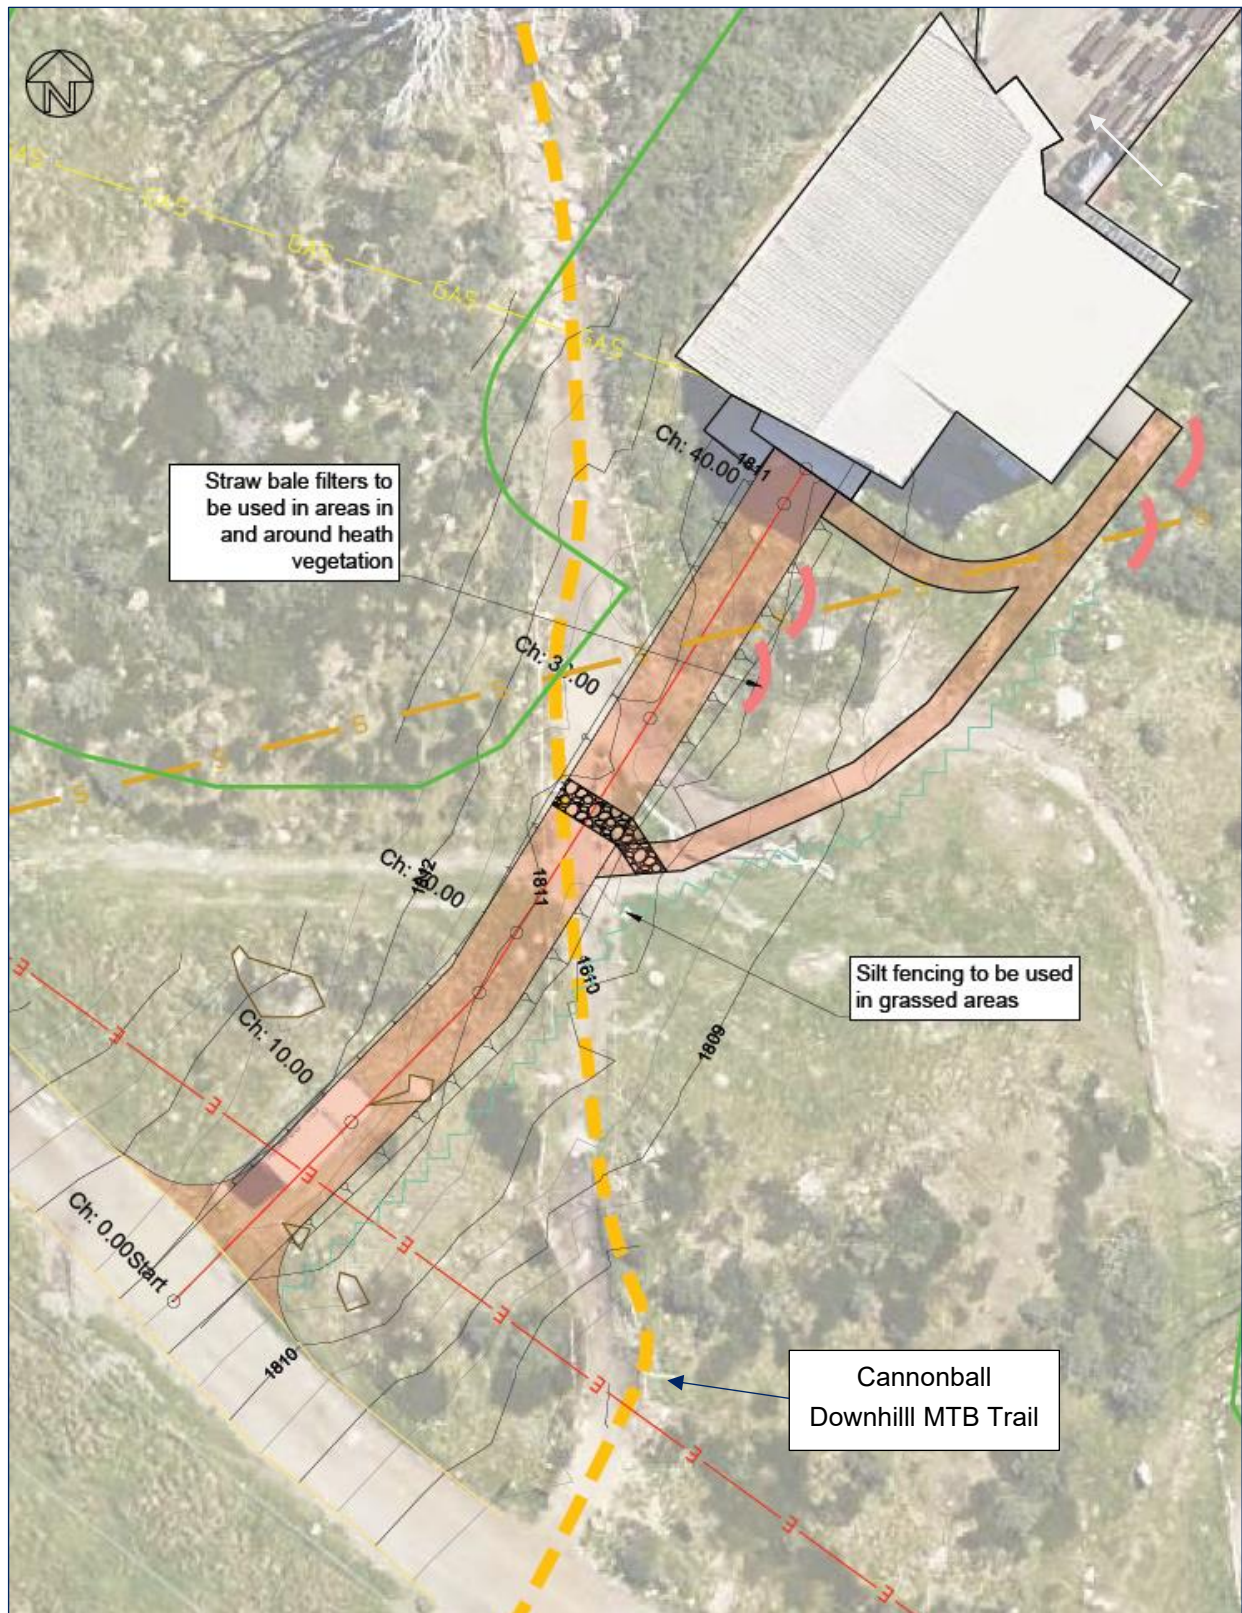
| Site plan identifying the proposed work location and Cannonball Downhill MTB trail (Source: Applicant's documentation)
